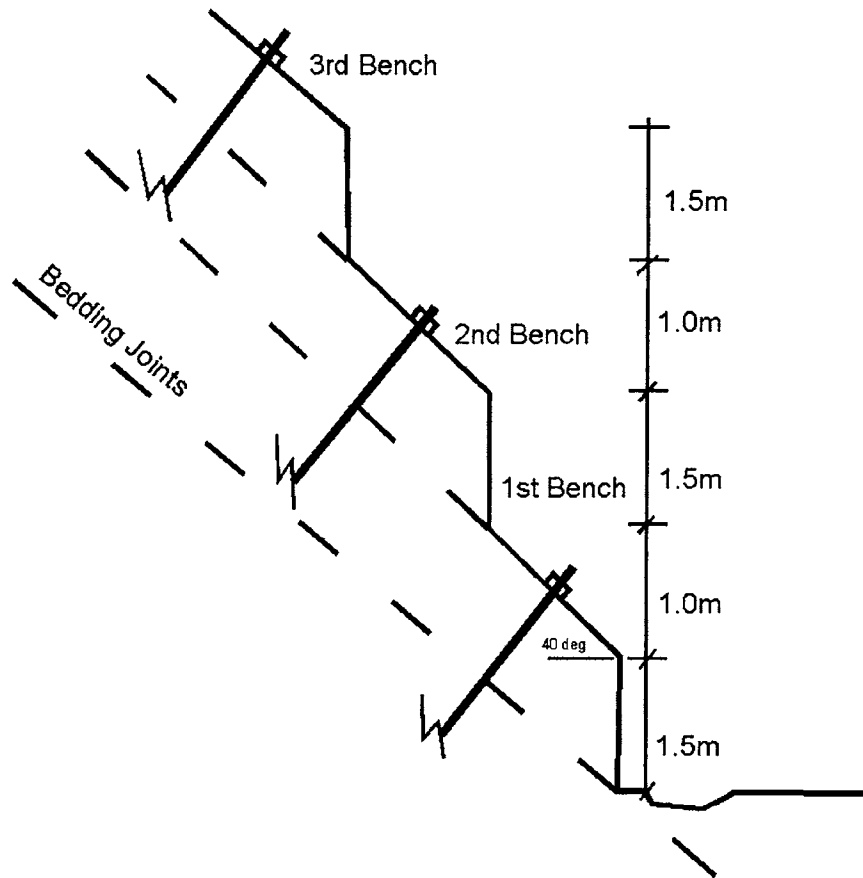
Schematic cross section of rock slope at Ellenville, New York.
